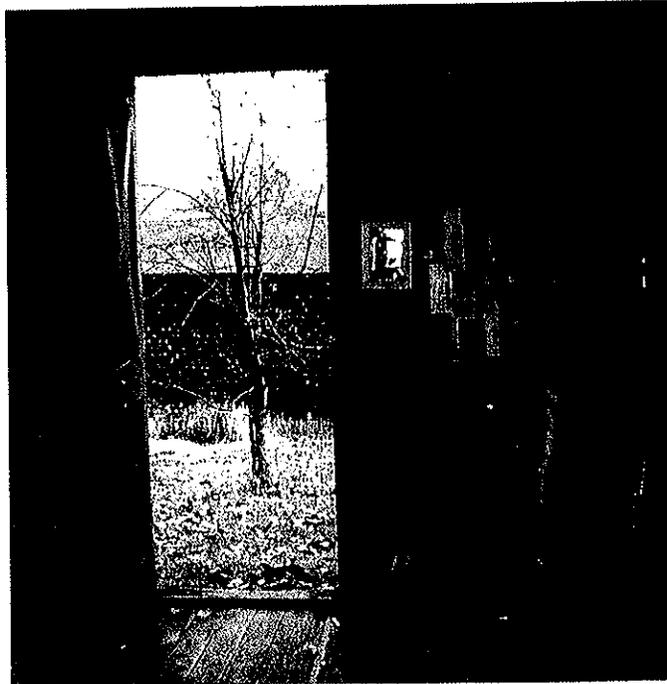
Weir Studio - Studio [Room 101], East Wall, Doorway D1 (1992).
